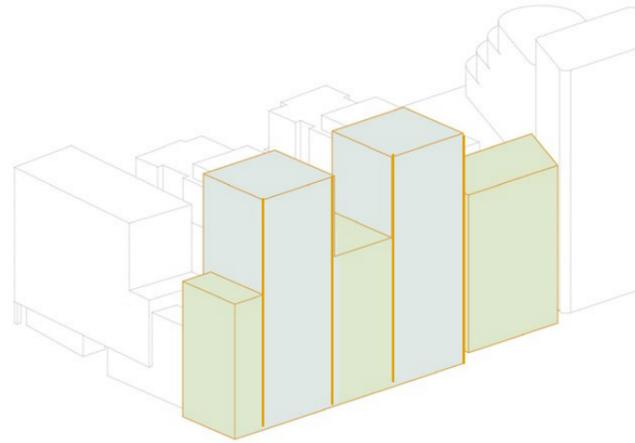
Building B2B3 treated as a horizontal plinth with rising towers.
